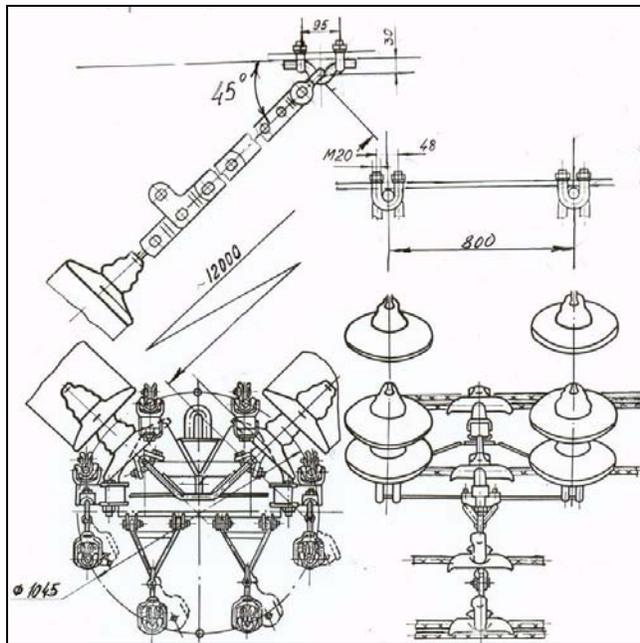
A V-set for suspension of a middle phase bundled conductor to the crossarm of a suspension tower of POG 1150 type together with attachment assemblies of KG-21-1 type.
